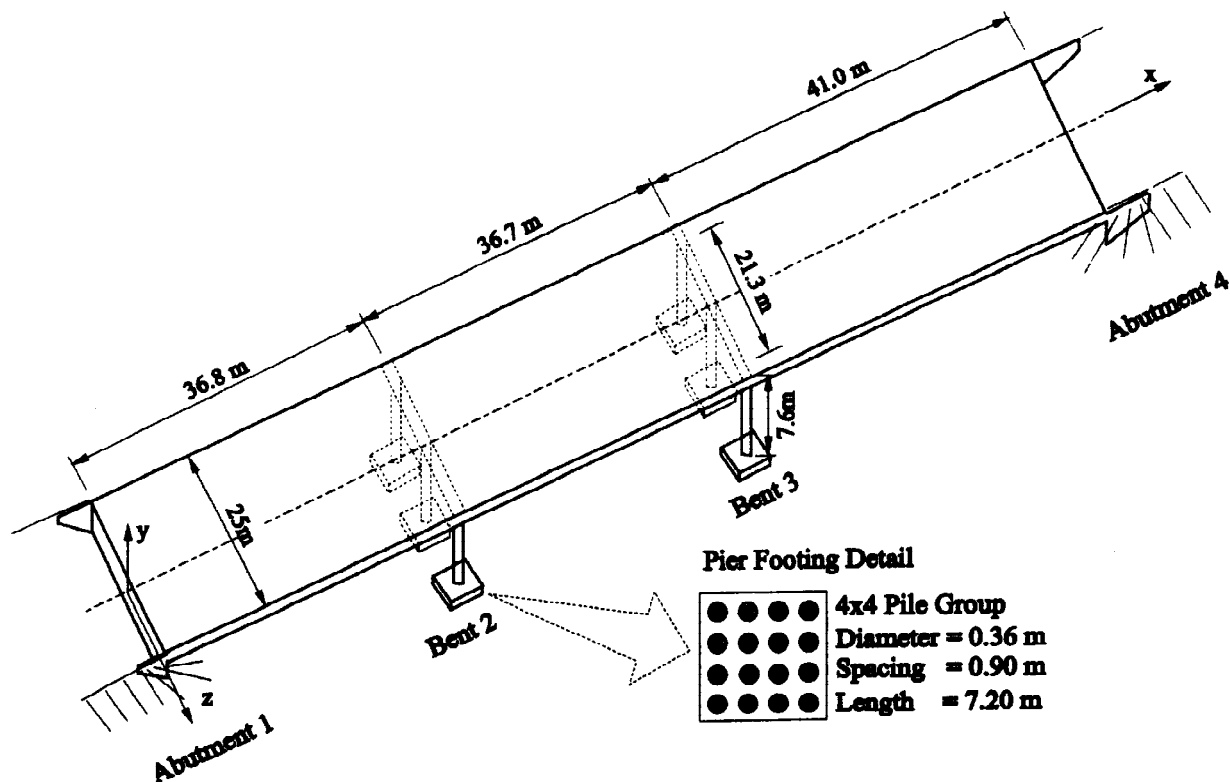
Bridge and pile foundations used in PILE-3D analyses.
